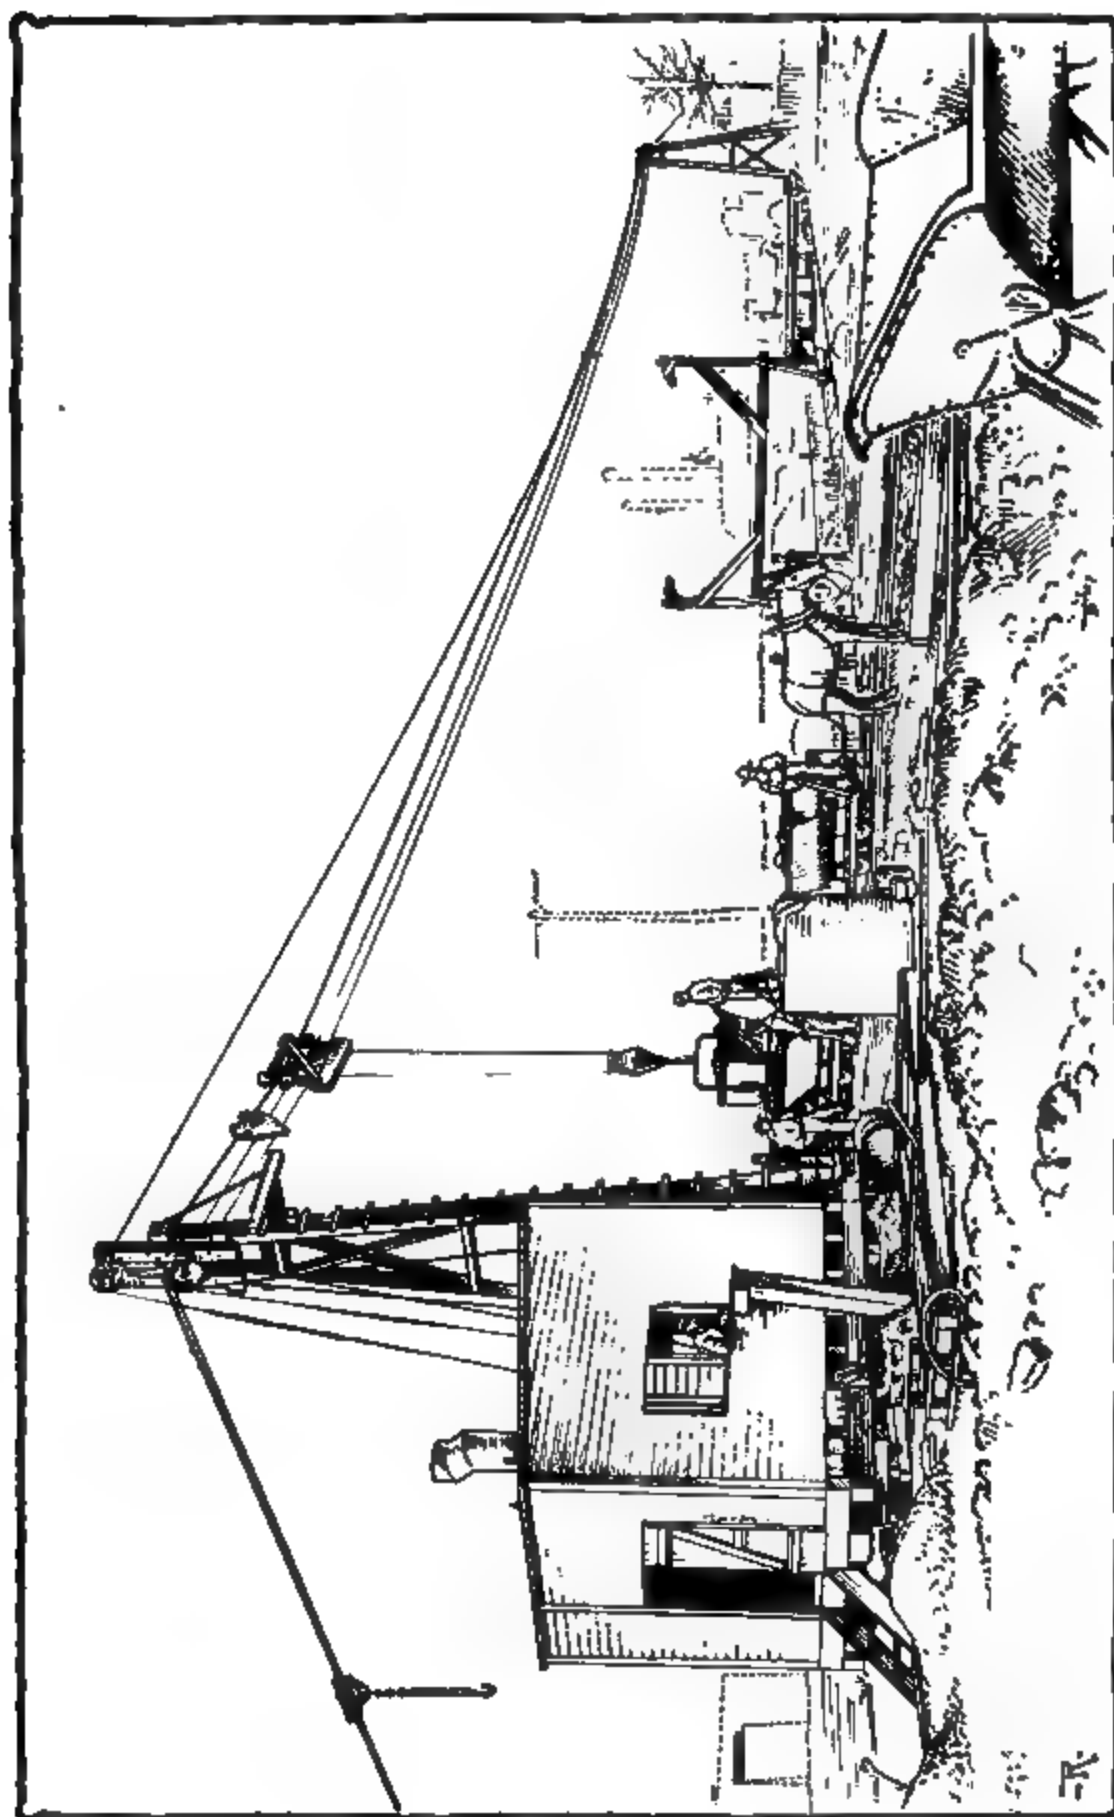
Cableway used on St. Louis sewers (Lambert).
